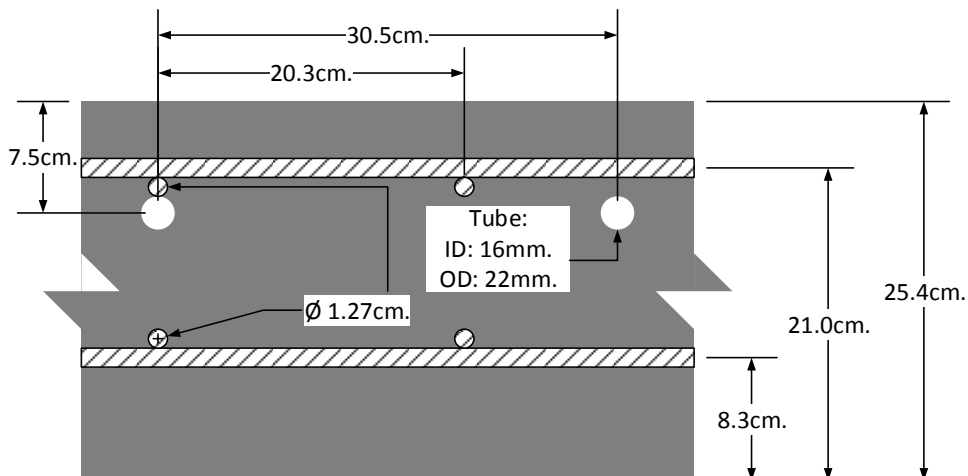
Cross sectional details of the slab with circulation tubes spaced 30.5 cm apart.
